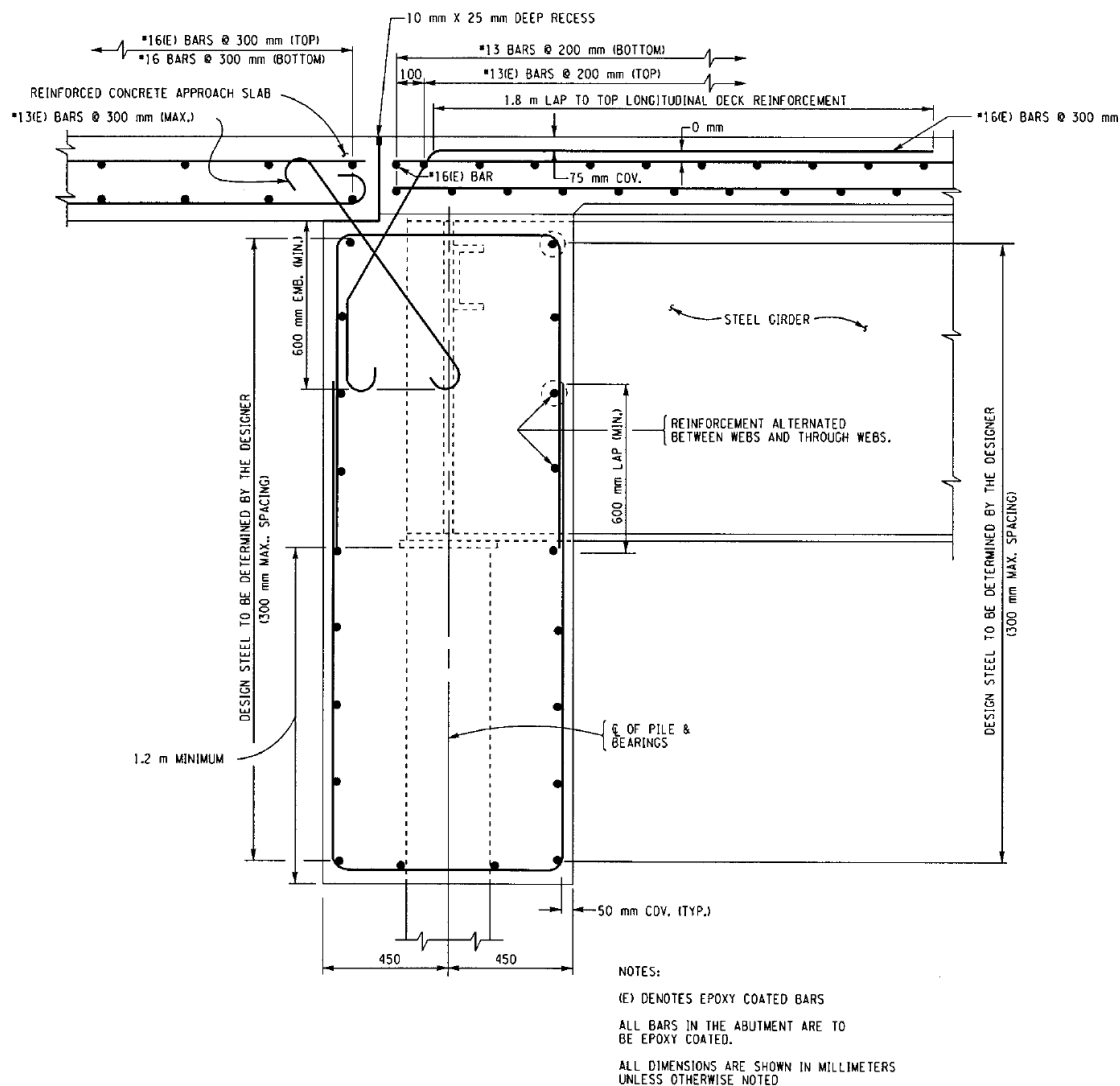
New York State DOT detail for integral abutments with steel girders
